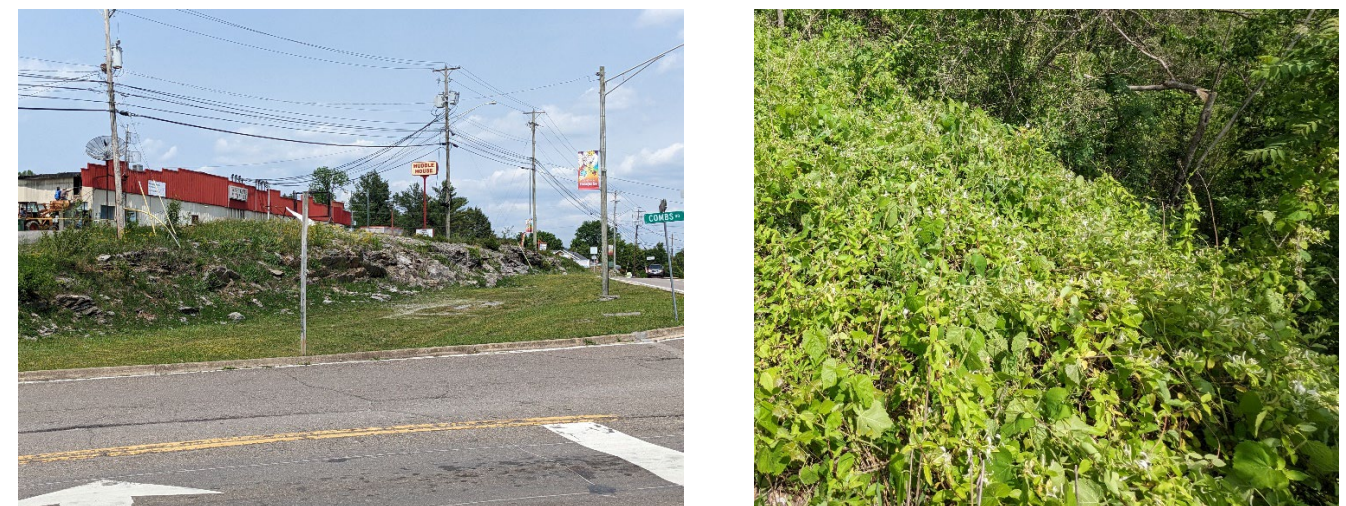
Site Photos showing Engineering Constraints for Proposed Roundabout (Left Image: elevation difference and rock formations northeast of intersection. Right Image: slope drop off south of intersection).
